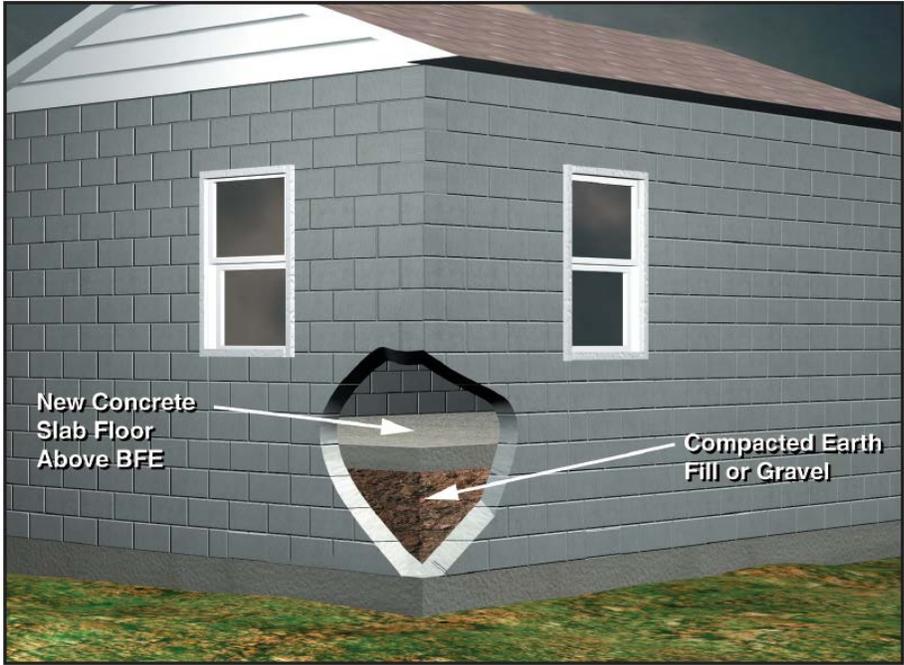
Basement was filled and compacted to build a new concrete floor to be one foot above the base flood elevation
